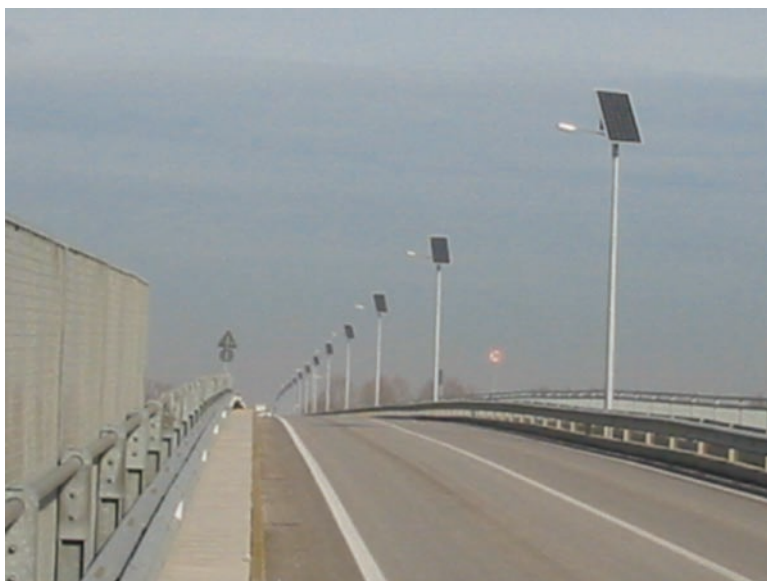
Lighting on the bridge of the Po River (see *Color Plates*)
